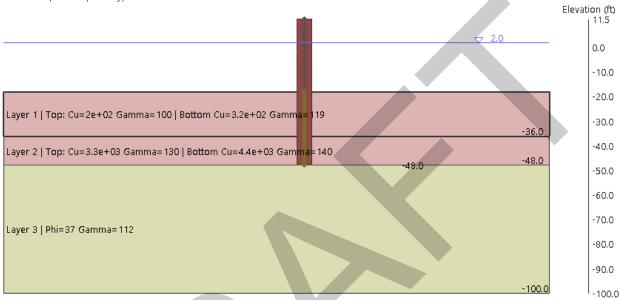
18" SuperPILE Soil Cross Section – C2 SOIL
